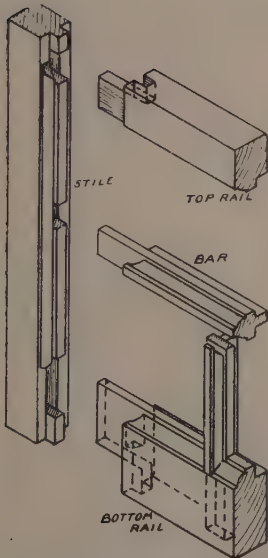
CASEMENT WINDOW CONSTRUCTION.
